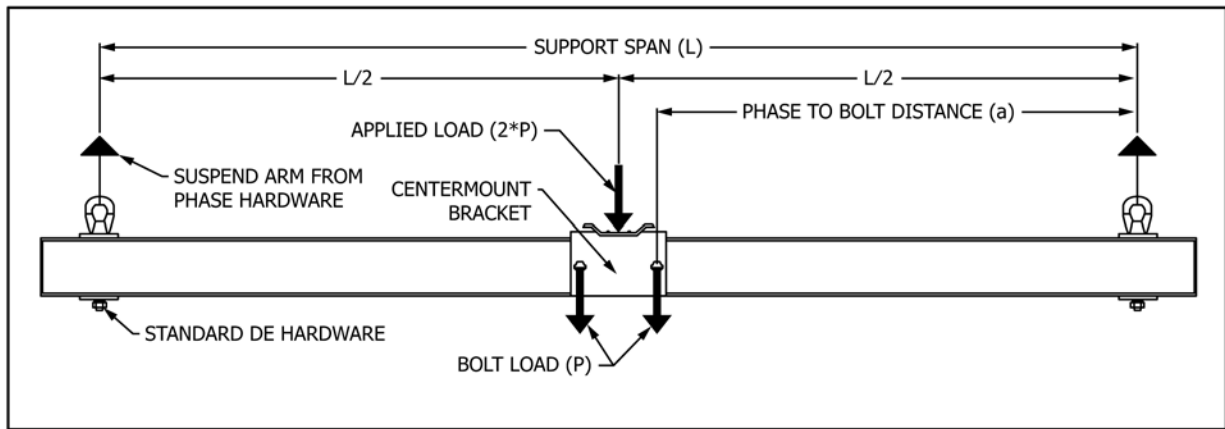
Three-Point Bend Dead End Crossarm Test Set Up
